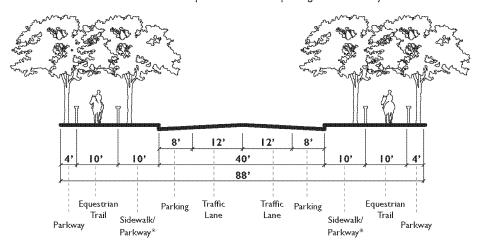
(3 of 3): CITY OF CHINO GENERAL PLAN ROADWAY CROSS-SECTIONS
